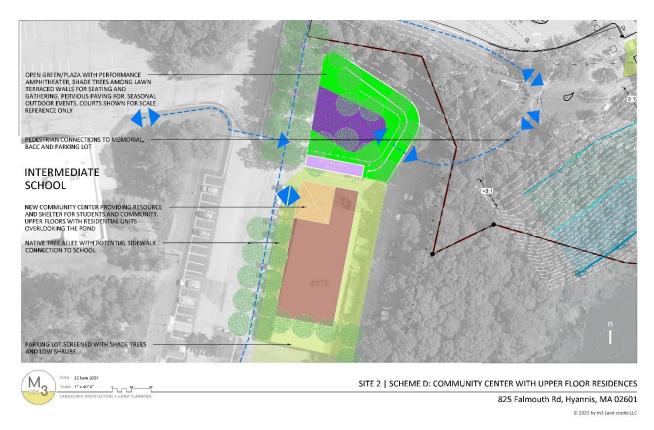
Site 2 | Scheme D. See Appendix for 11x17 scaled plan drawing.
